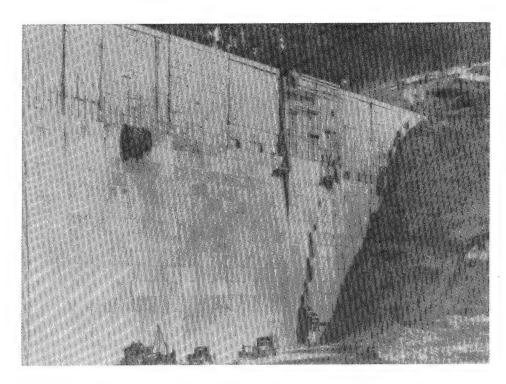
Portion of upstream face of Barker Dam with precast panels installed about three-fourths of its height (from Davis, Jansen, and Neelands 1948b)
